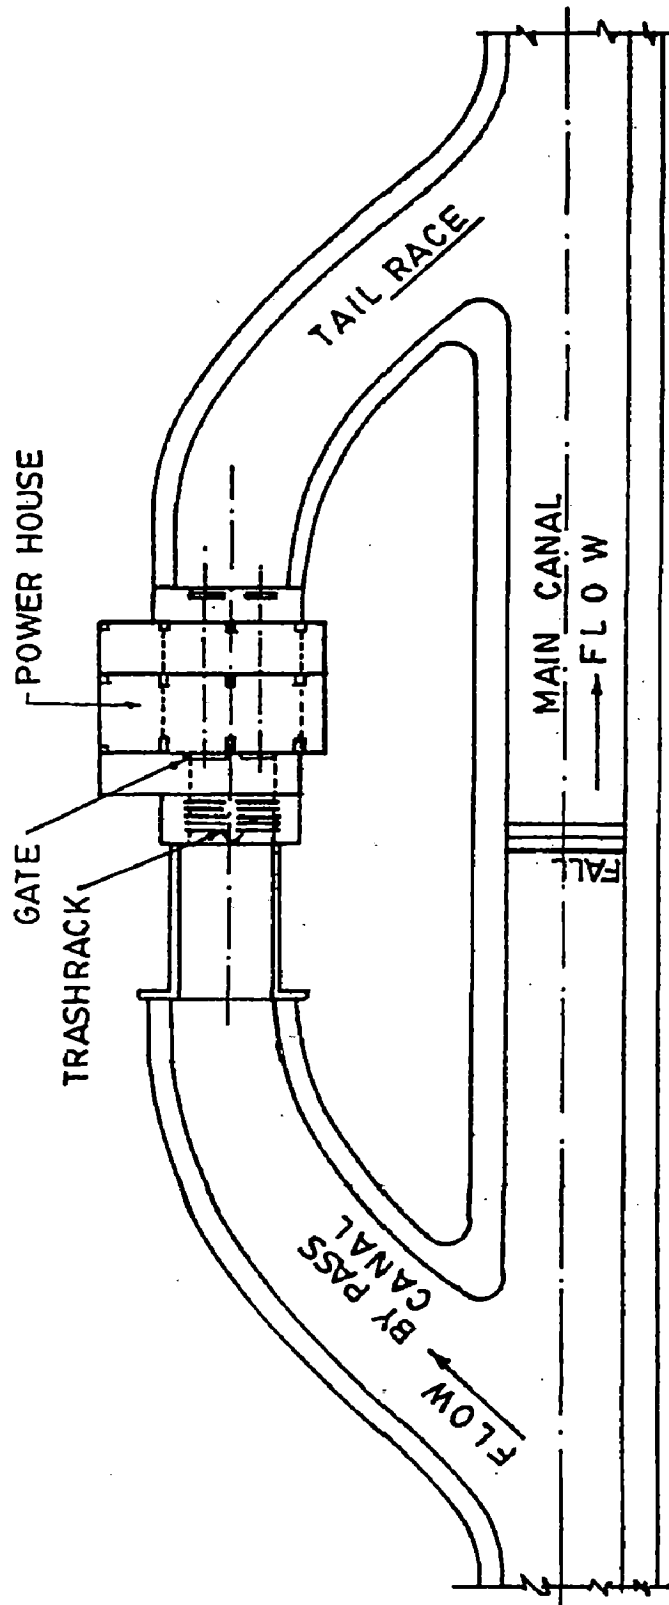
TYPICAL LAYOUT OF CANAL FALL SMALL HYDRO POWER SCHEME
